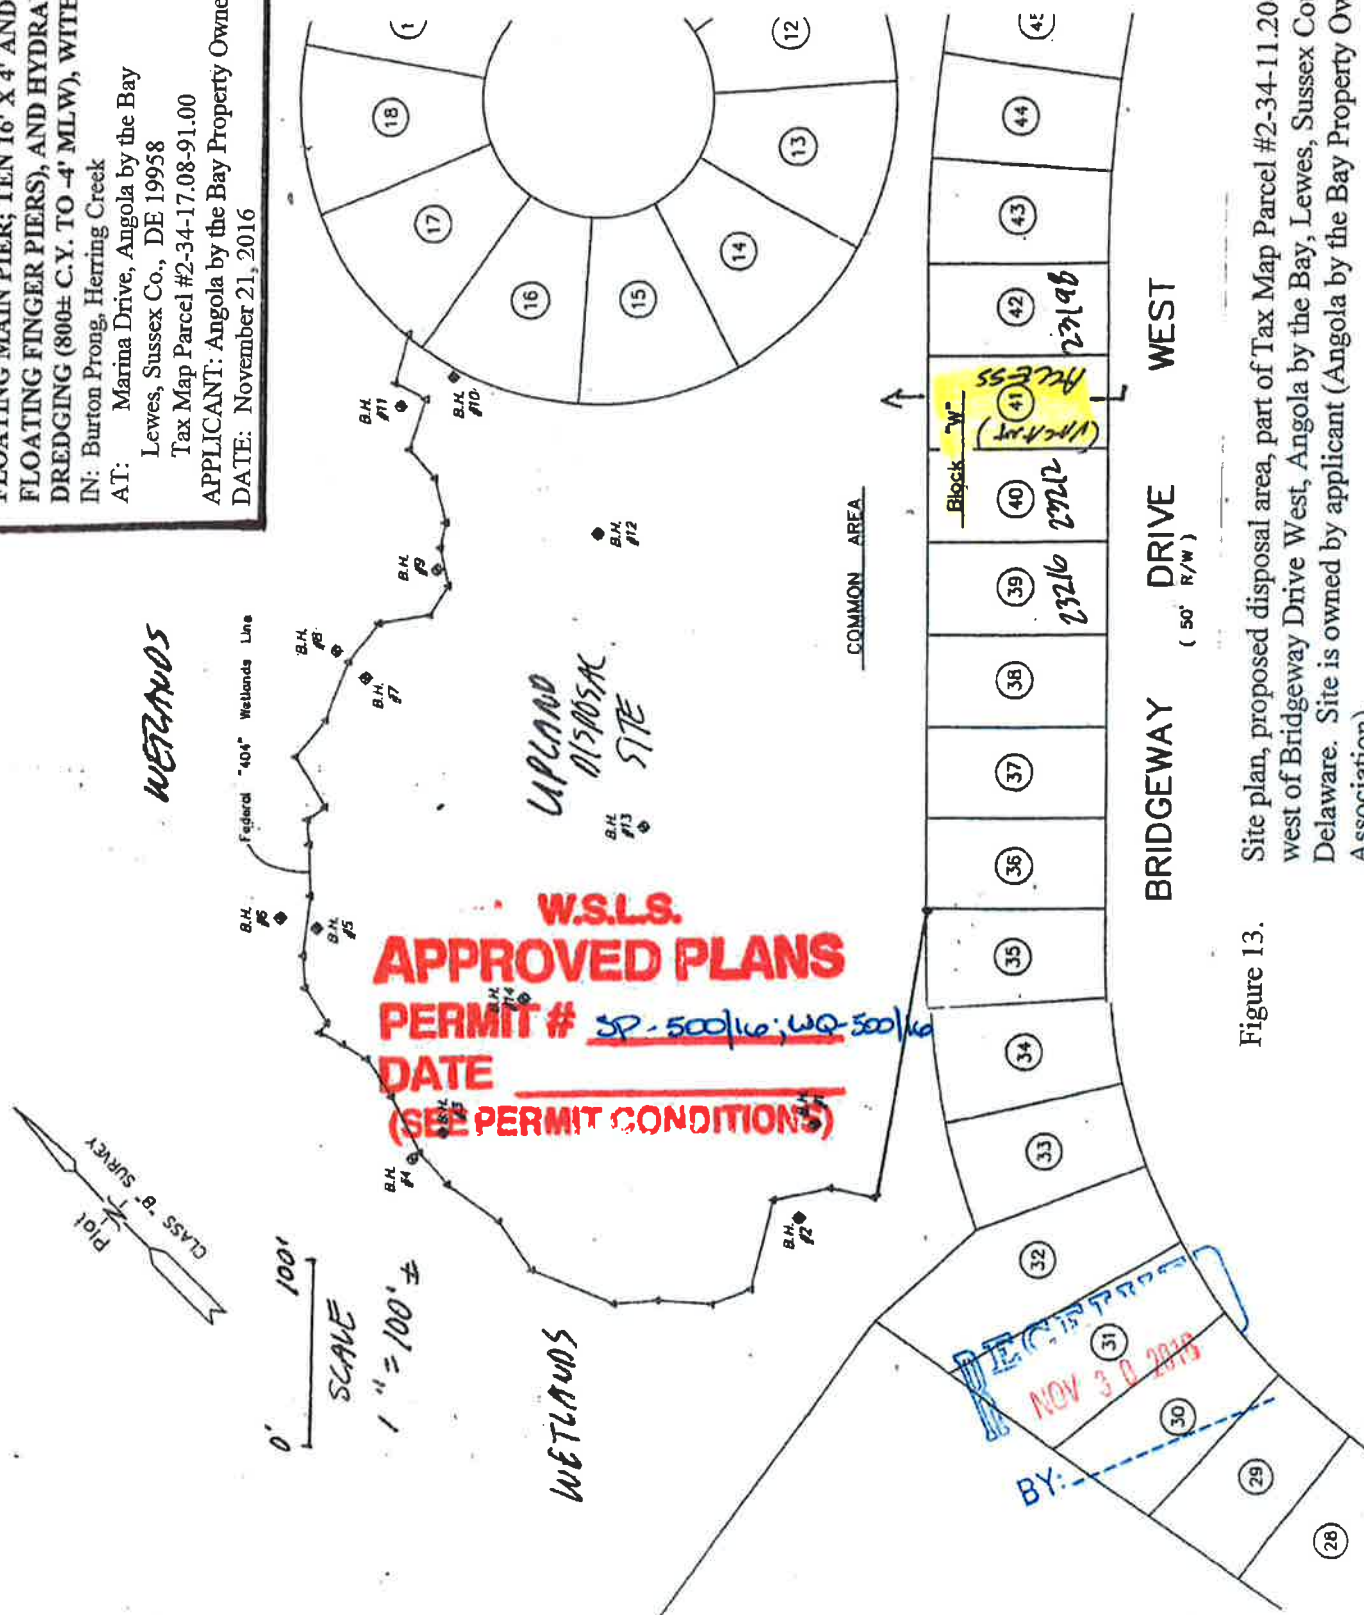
Site plan, proposed disposal area, part of Tax Map Parcel #2-34-11.20-128.00 west of Bridgeway Drive West, Angola by the Bay, Lewes, Sussex County, Delaware. Site is owned by applicant (Angola by the Bay Property Owners Association).
